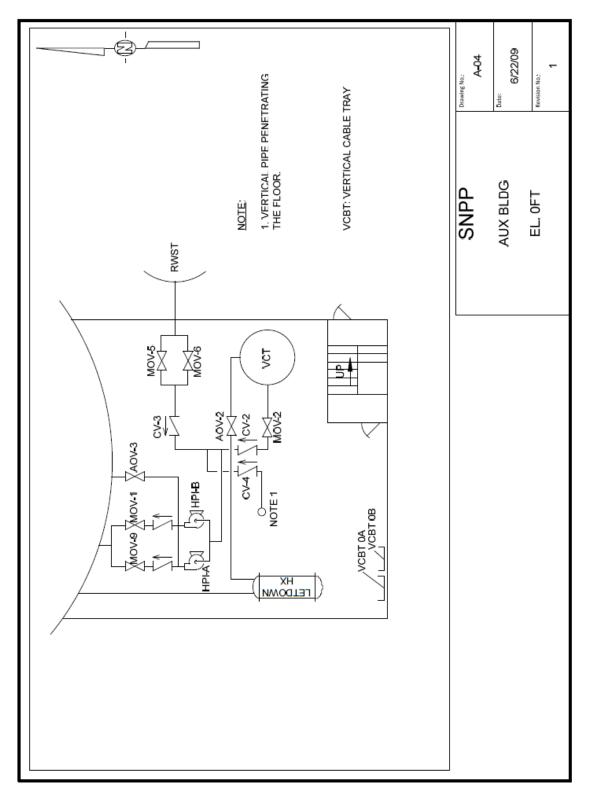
Auxiliary Building – Elevation 0 Ft
